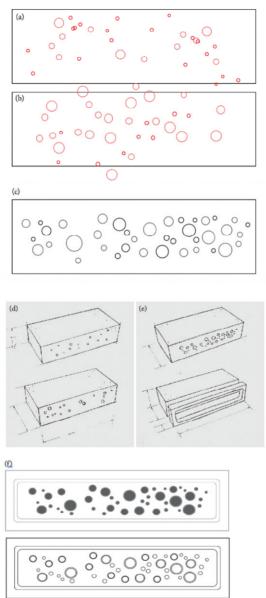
(a) Bricks within block walls (b) Bee Bricks in brick wall
